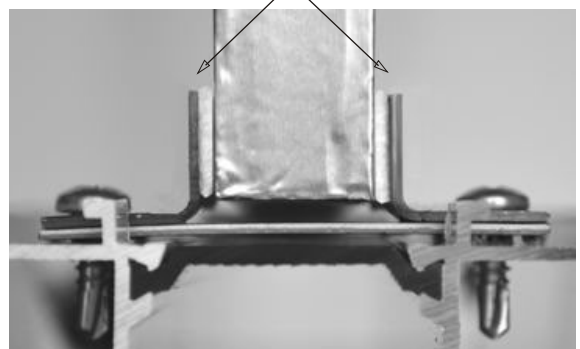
Proper mounting (felt washer, not deformed) and improper mounting (lack of clearance caused by non-parallel screwing of steel angle bar or by use of inappropriate angle bar)
